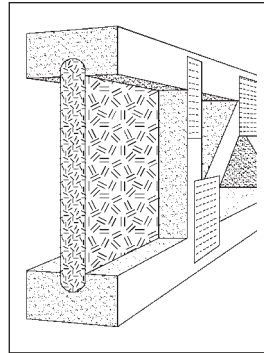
TrimJoist combination open-web truss and I-joist.
